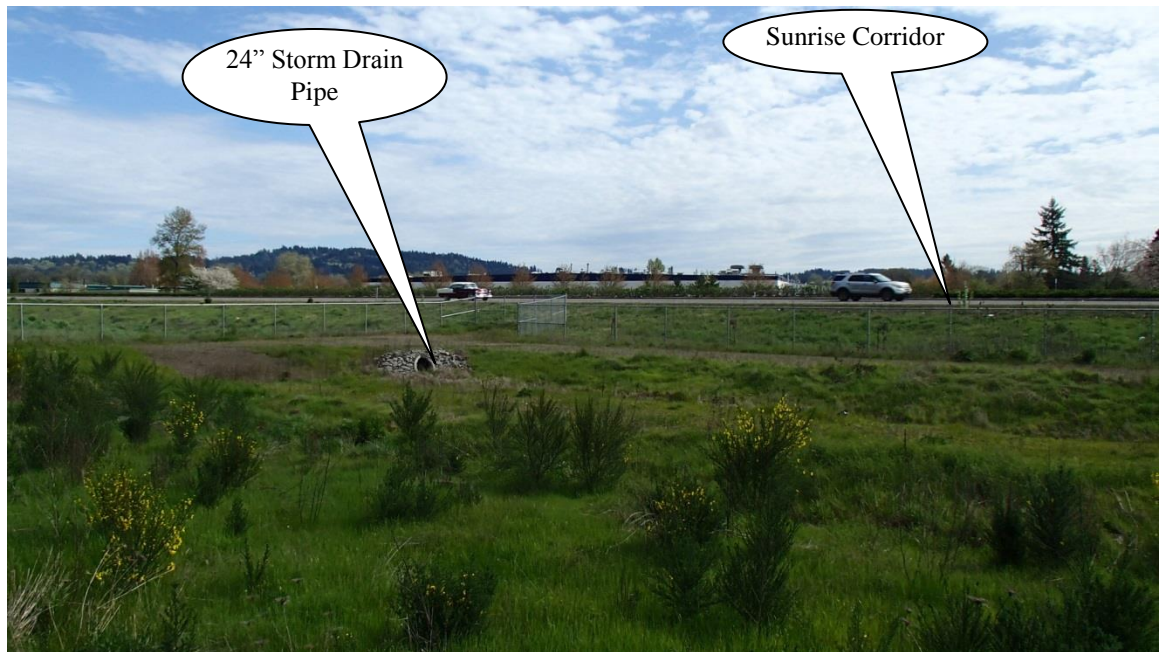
a view of bio-retention pond, looking Southeast toward storm drain pipe.
